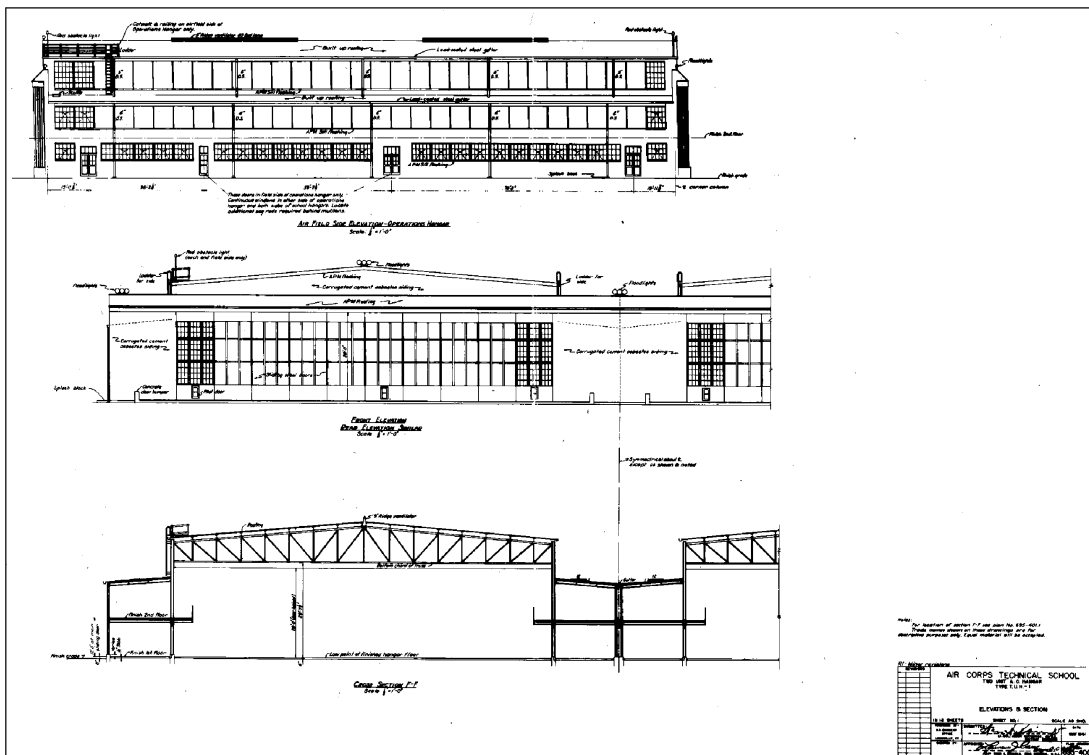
Plan No. 695-400.1, Air Corps Technical School, Two-Unit Hangar (Type TUH-1), ca. 1941. (Source: 105mm film archives at U.S. Army Corps of Engineers History Office, Fort Belvoir, VA.)
